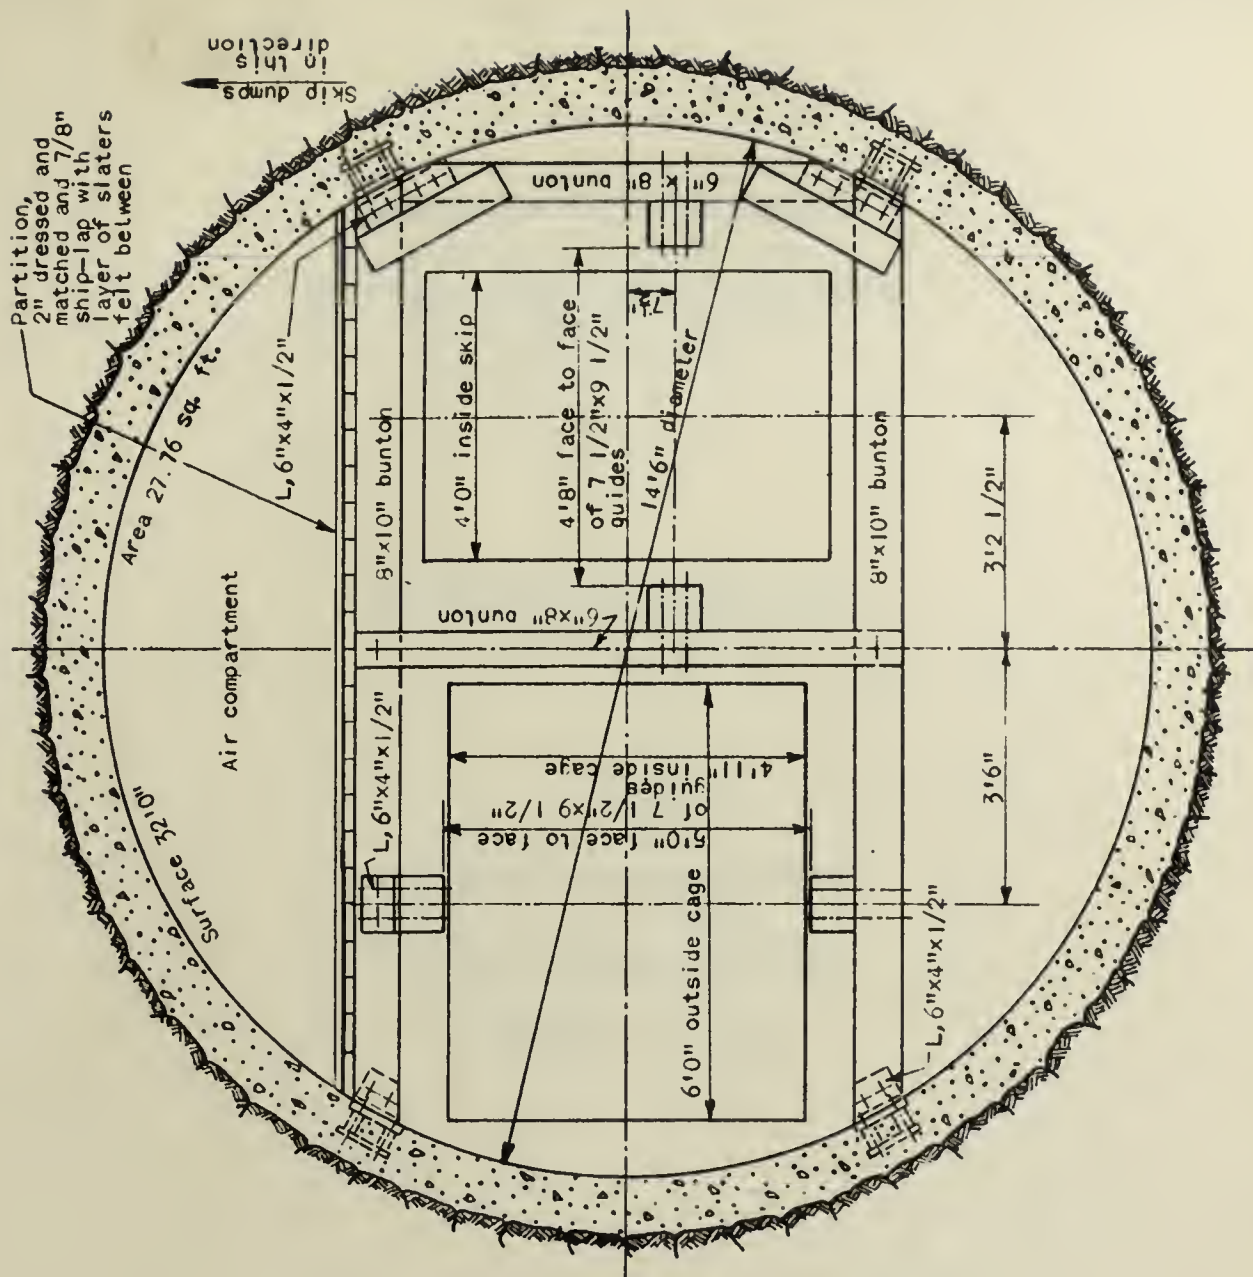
Typical section of shaft in salt, showing location of guides and skip
